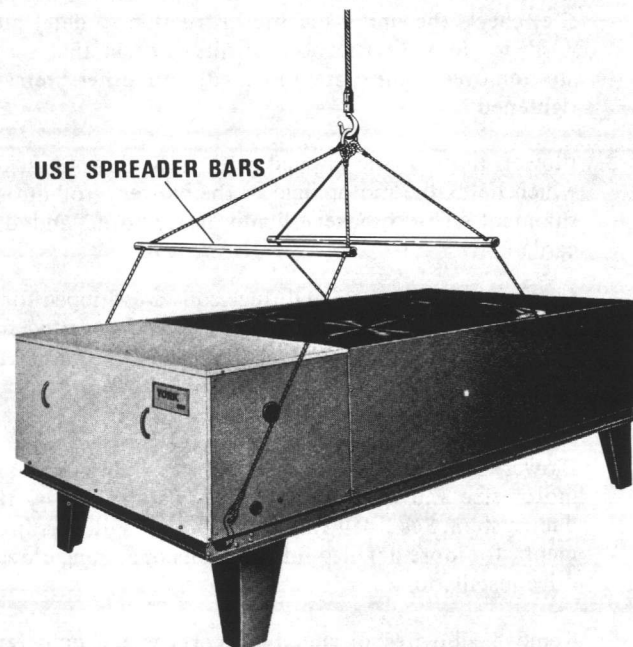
TYPICAL RIGGING TO LIFT UNITS
